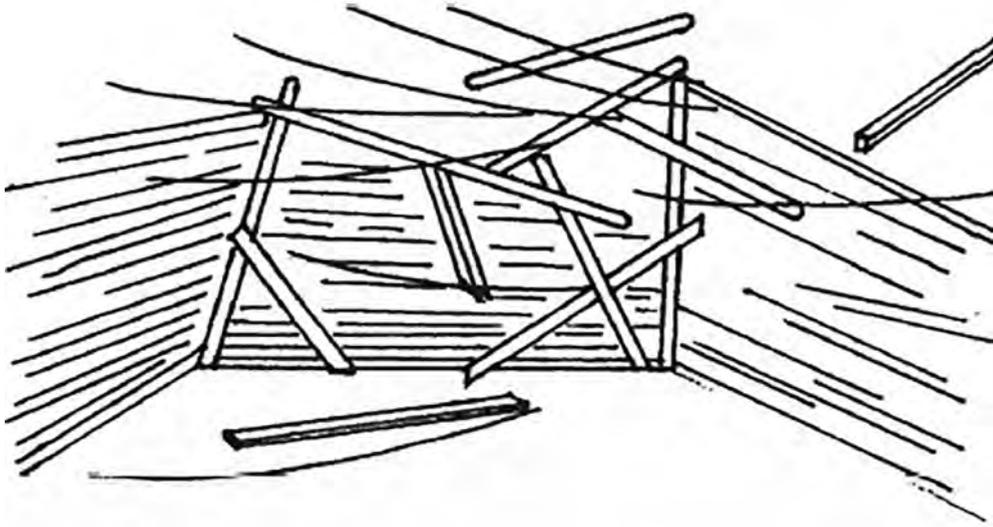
POORLY BRACED AND JOINTED HOUSES WILL BREAK UP
